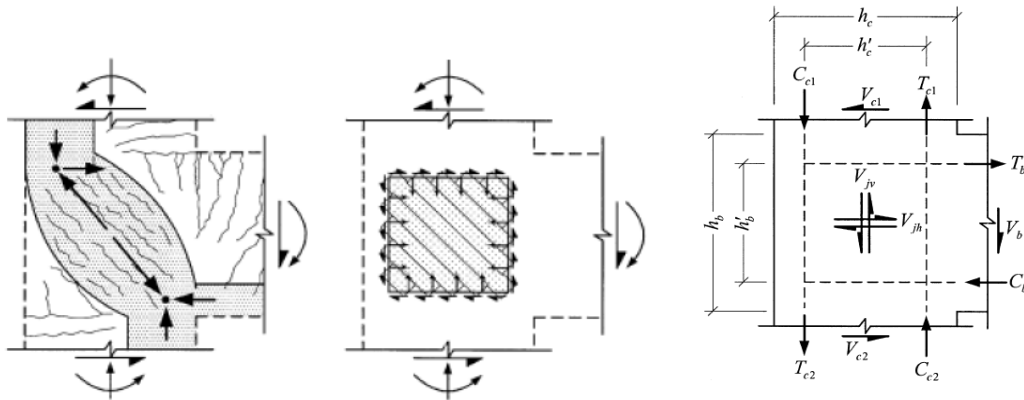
Exterior Beam Column Joint Subjected to Seismic Loading, Park and Paulay [4]
